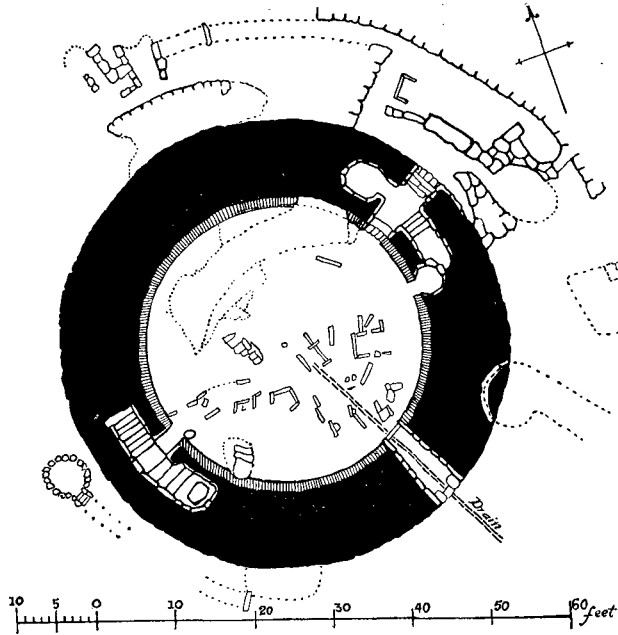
Ground Plan of Keiss Broch and its outbuildings.
